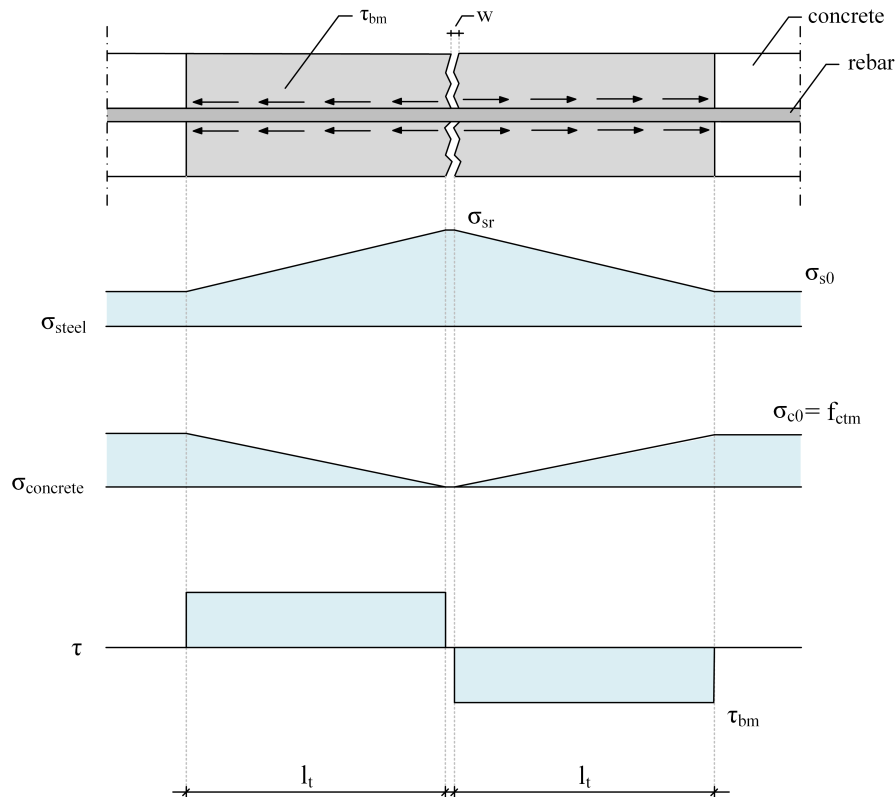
Stresses in concrete and reinforcing steel at the location of a crack
